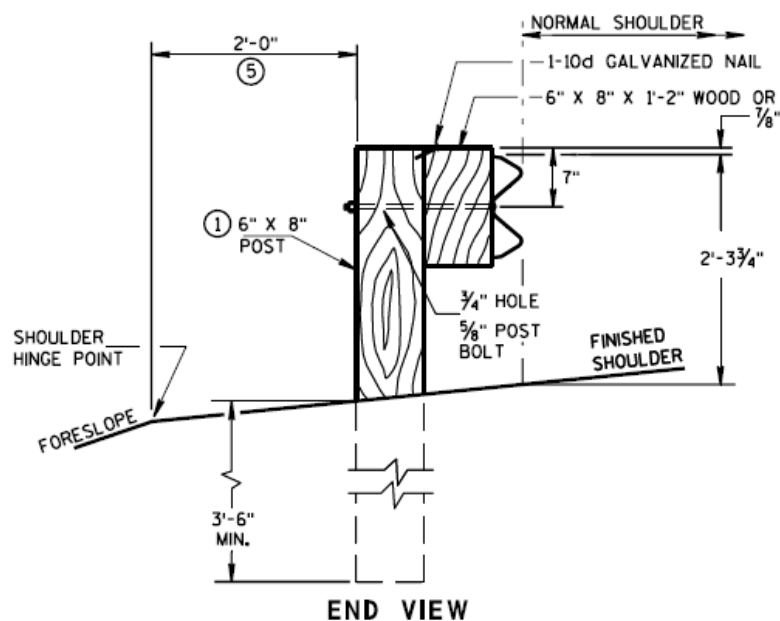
Standard detail of timber post guardrail from WISDOT.
